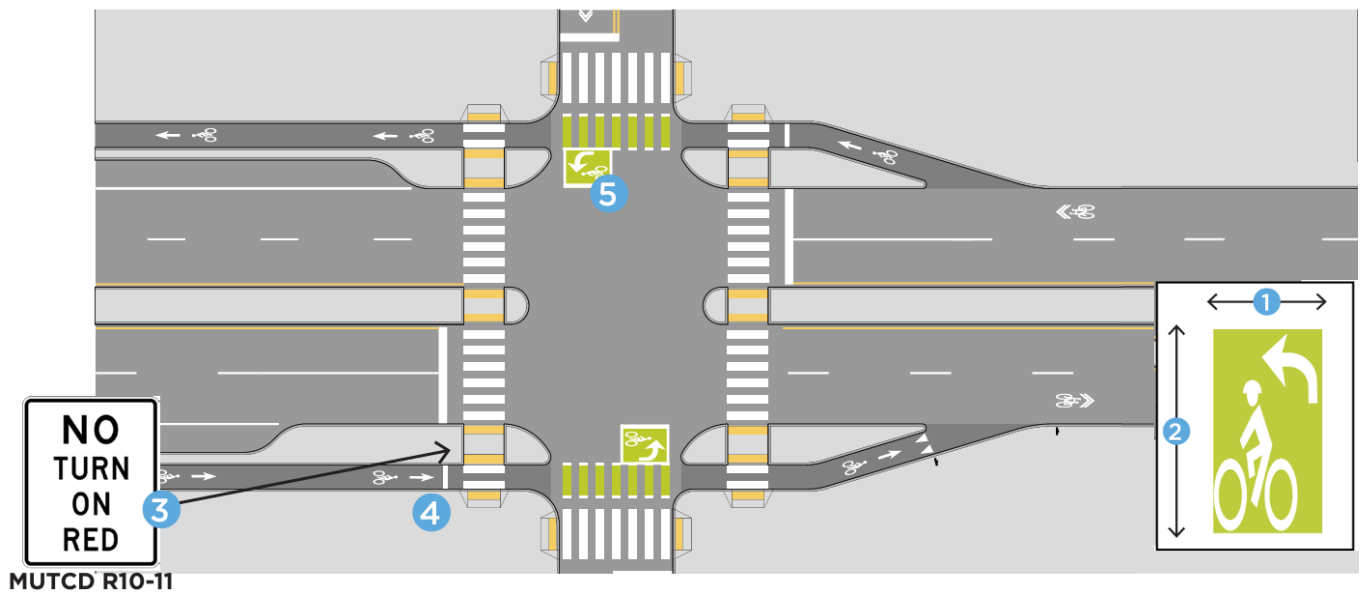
Protected Intersection Elements (One-way to Neighbourhood Bikeway)
